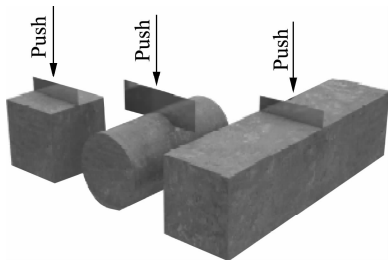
Manufacture of pre-cracks in the concrete specimens
